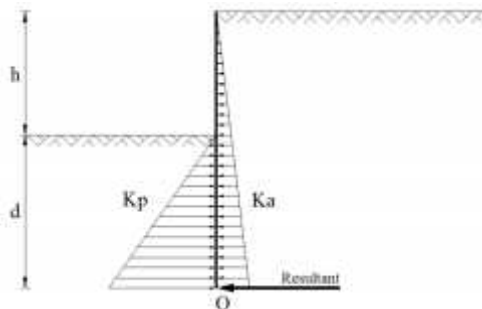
Conventional design method of Cantilever Sheet Pile Wall in granular Soils
